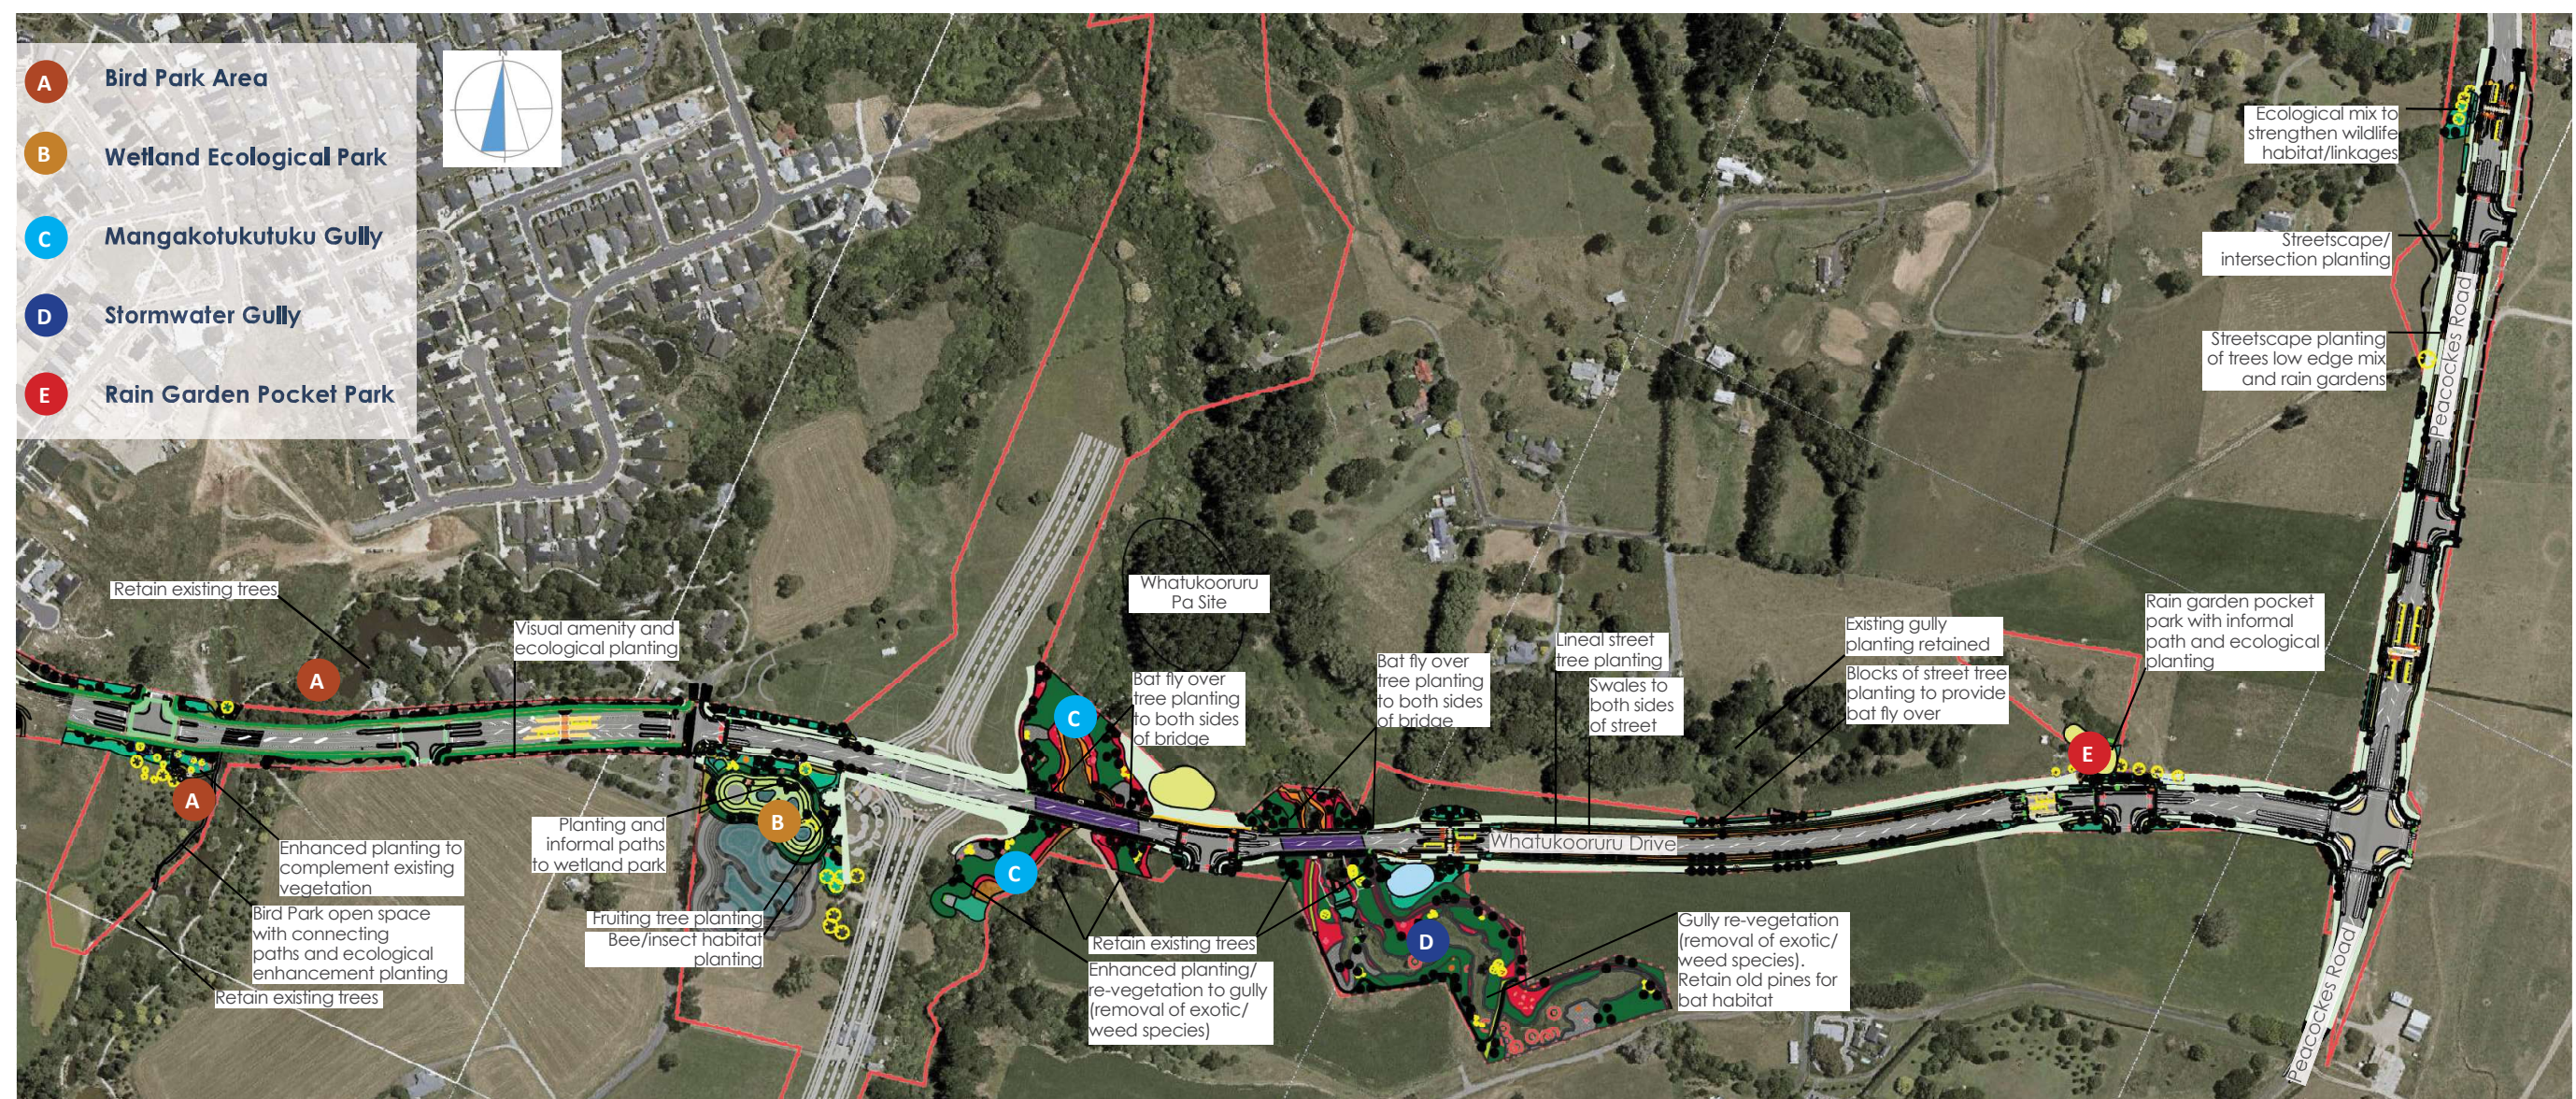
GENERAL ARRANGEMENT OF PLANTING TYPES AND AREAS
